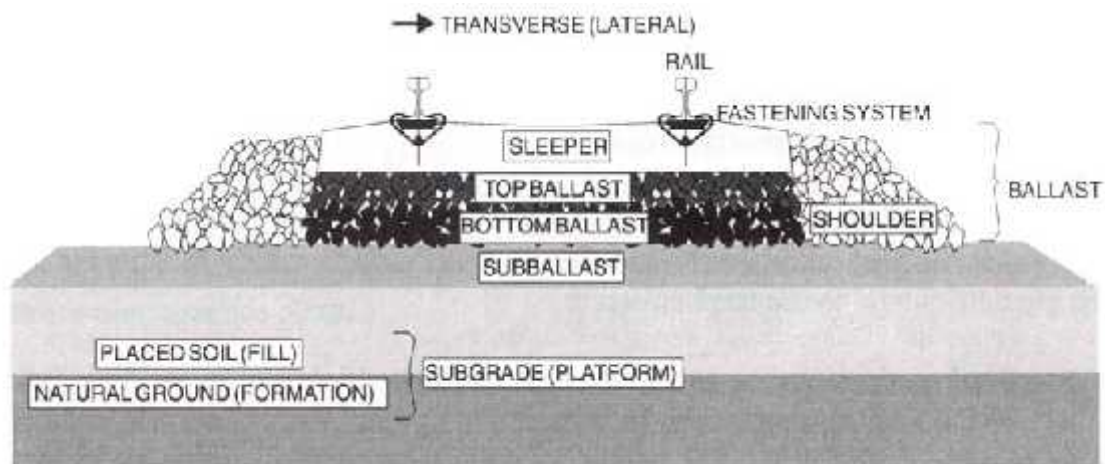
Track layout of a typical ballasted track- cross section (Selig & Waters, 1994).
